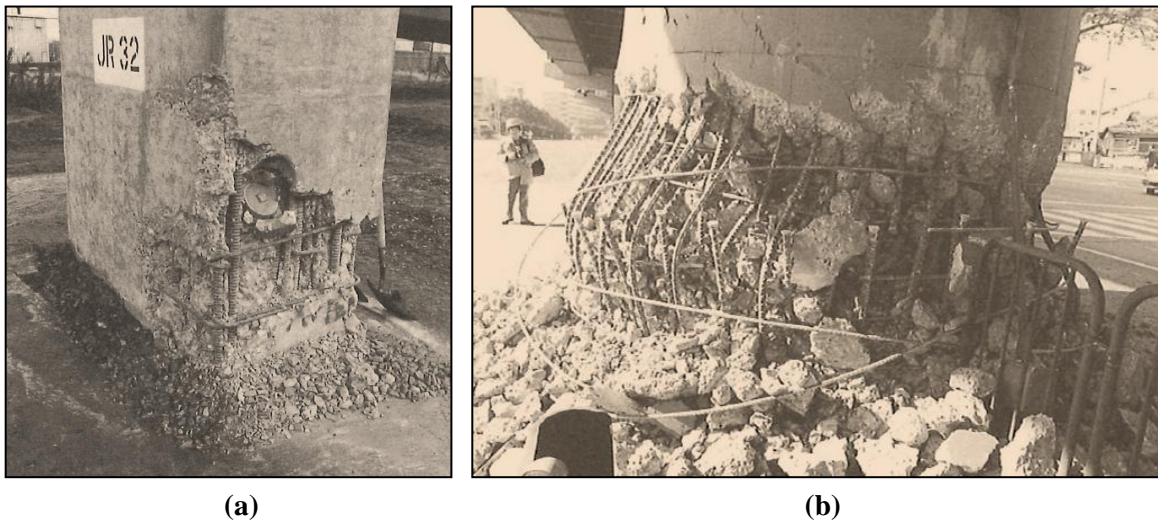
Bond failure of lap splices at column base, 1989 Loma Prieta earthquake [7]
